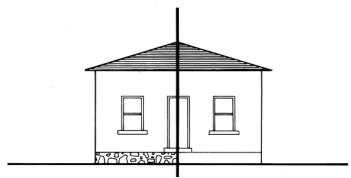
An original stone foundation before alteration compared to parging of the foundation, which alters the original character of the building (Source: Buttonville HCD Plan)
